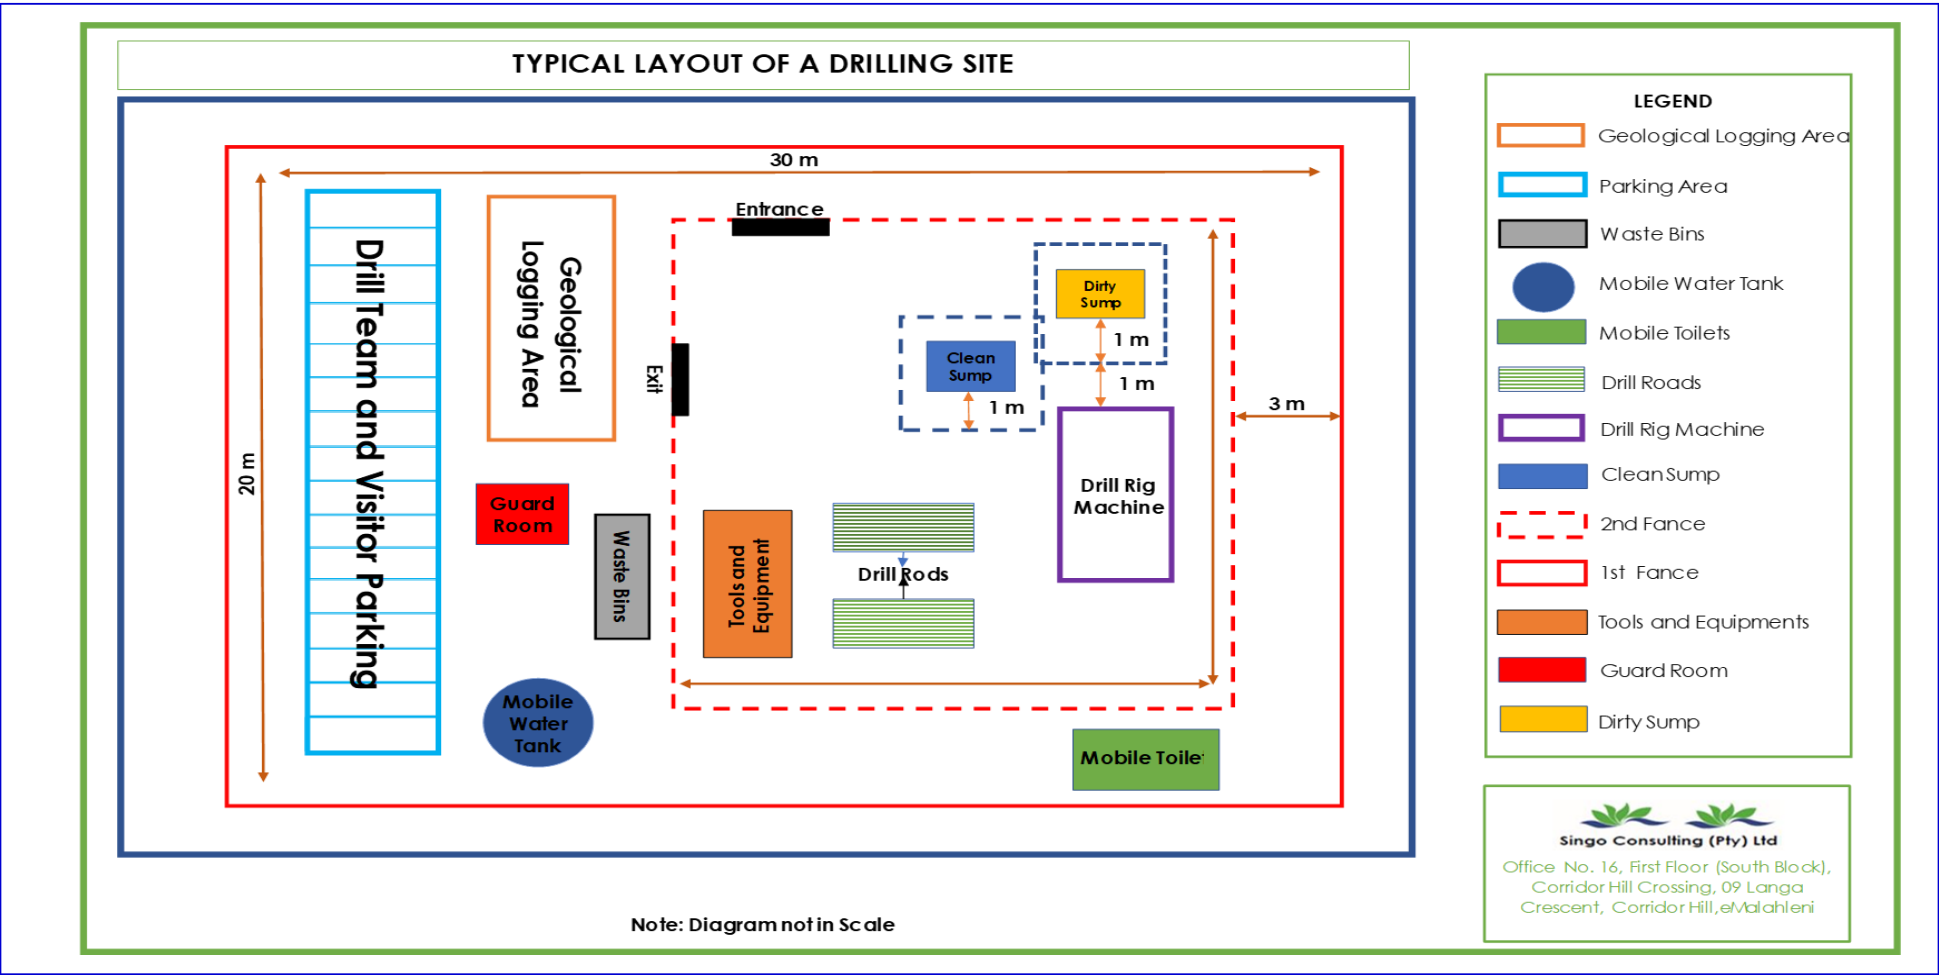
The drill site layout plan showing areas where specific activities will take place in the project area.
